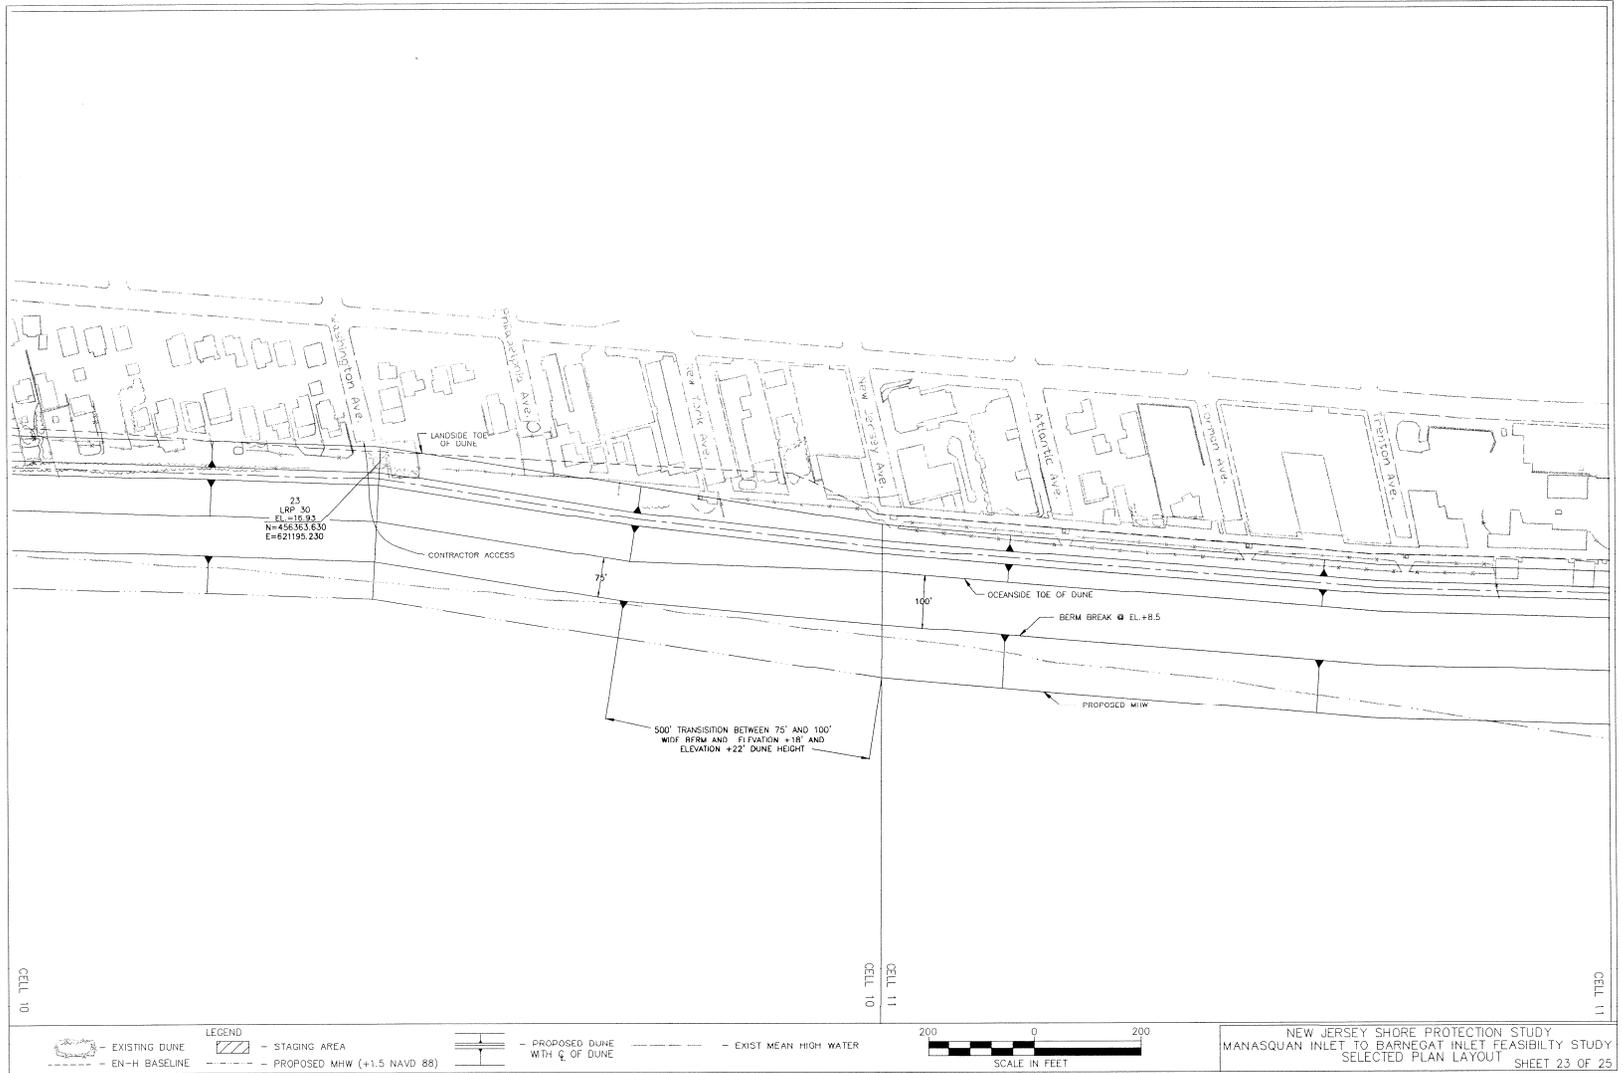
Selected Plan Layout – Point Pleasant Beach Borough, South of Washington Avenue to Trenton Avenue
